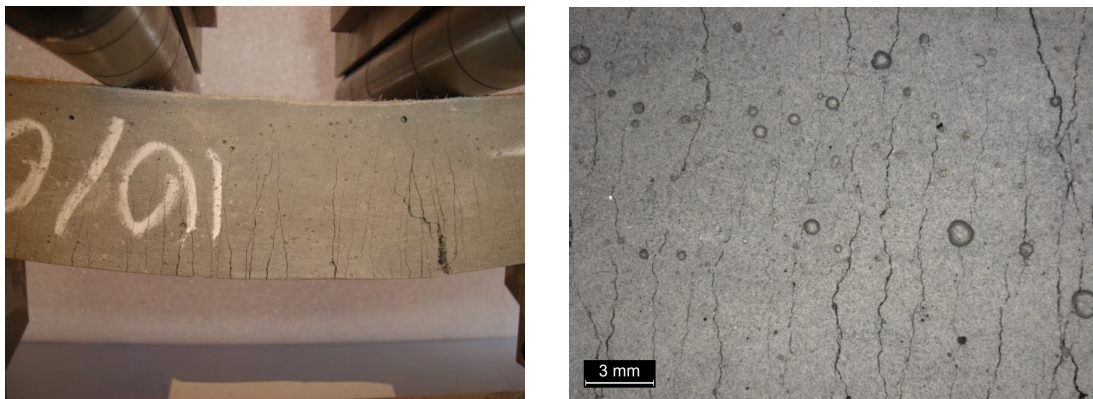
Typical cracking patterns of ECC beam specimen after flexure load applications (Mix ID.: FA1.2_0.55_1000)
